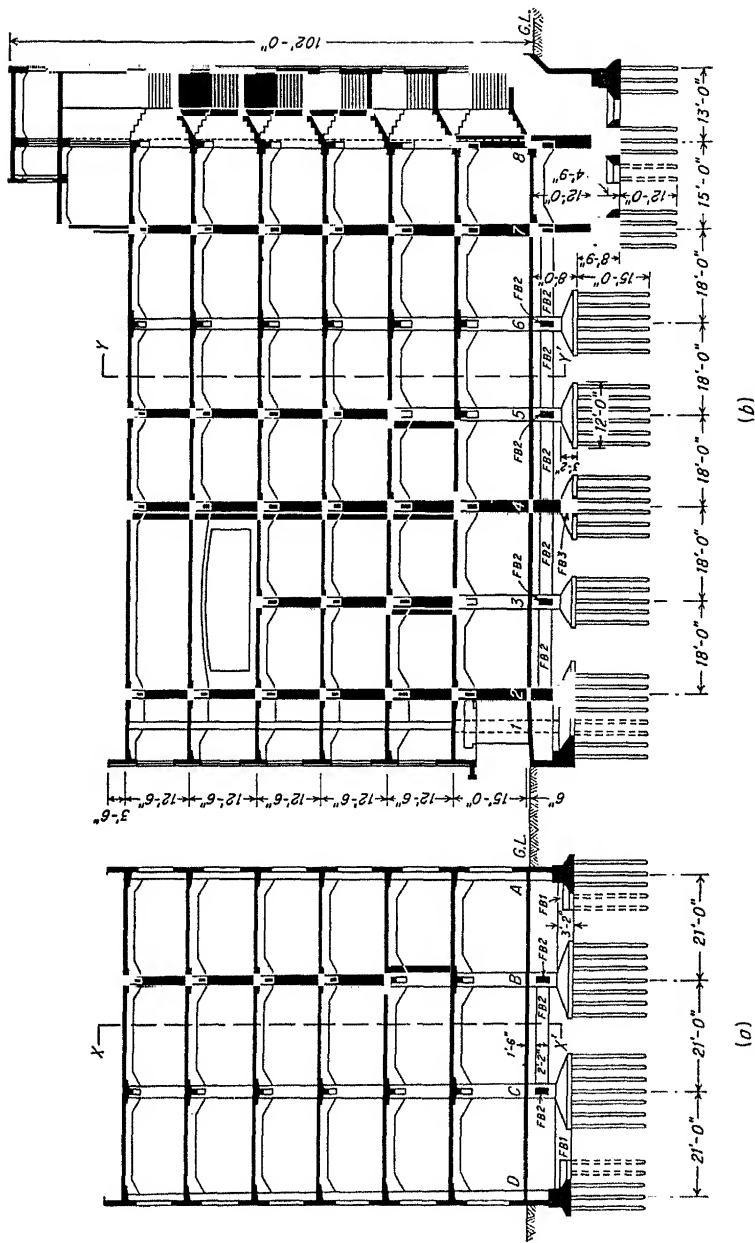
Sections, Daiwa Department Store. (a) Section Y-Y'; (b) section X-X'.
